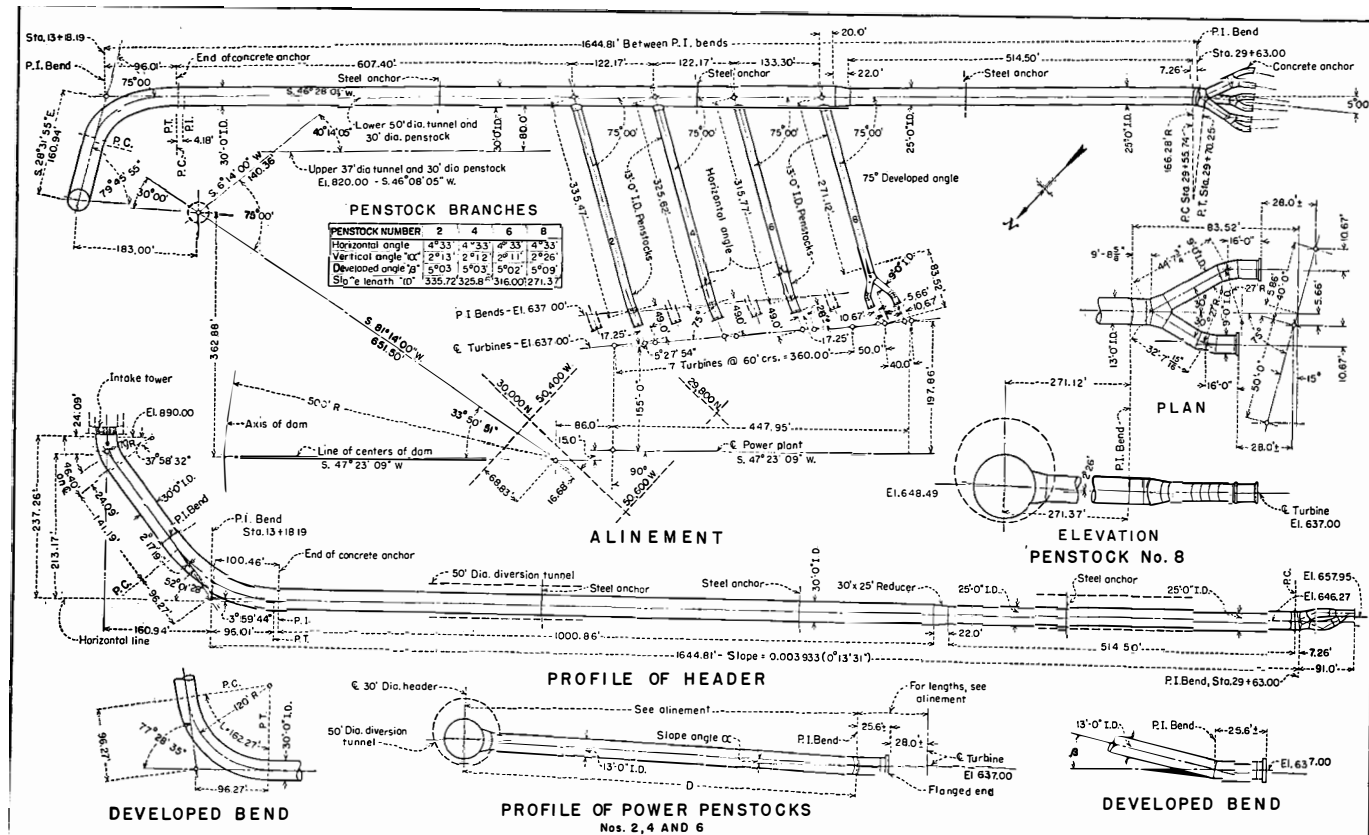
HEADERS, PENSTOCKS AND CONDUITS FOR LOWER ARIZONA TUNNEL
